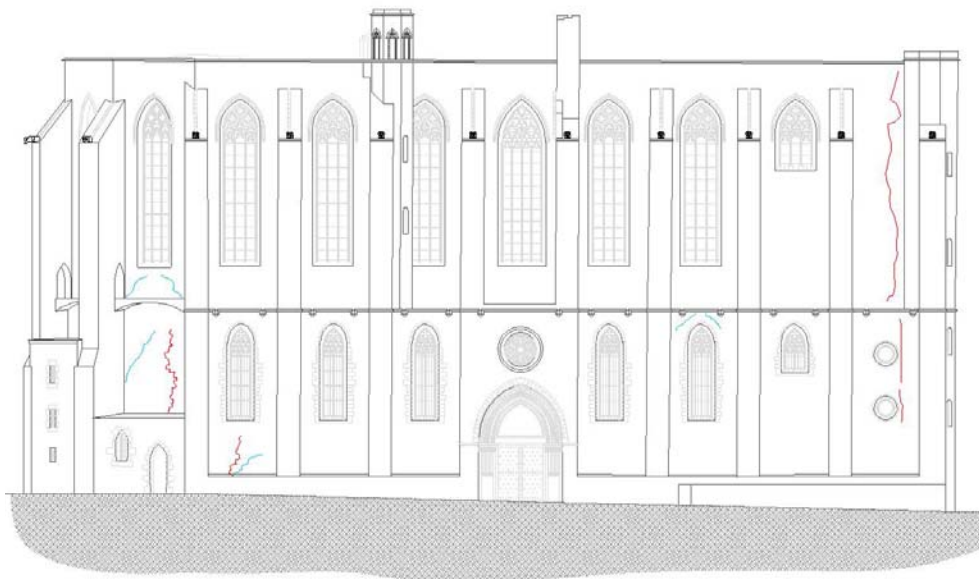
The damage pattern of the side façade of Santa Maria Del Pi
